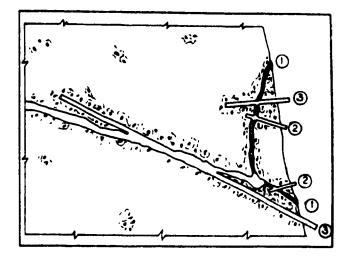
MECHANICAL CHINKING: DRILL CRACKS AT (3) TO ALLOW DRAINAGE; PLACE CHINKING AT (1); AND DRILL SHORT HOLES AT (2) TO PLACE CHEMICAL GROUT BEHIND CHINKING<sup>28</sup>
